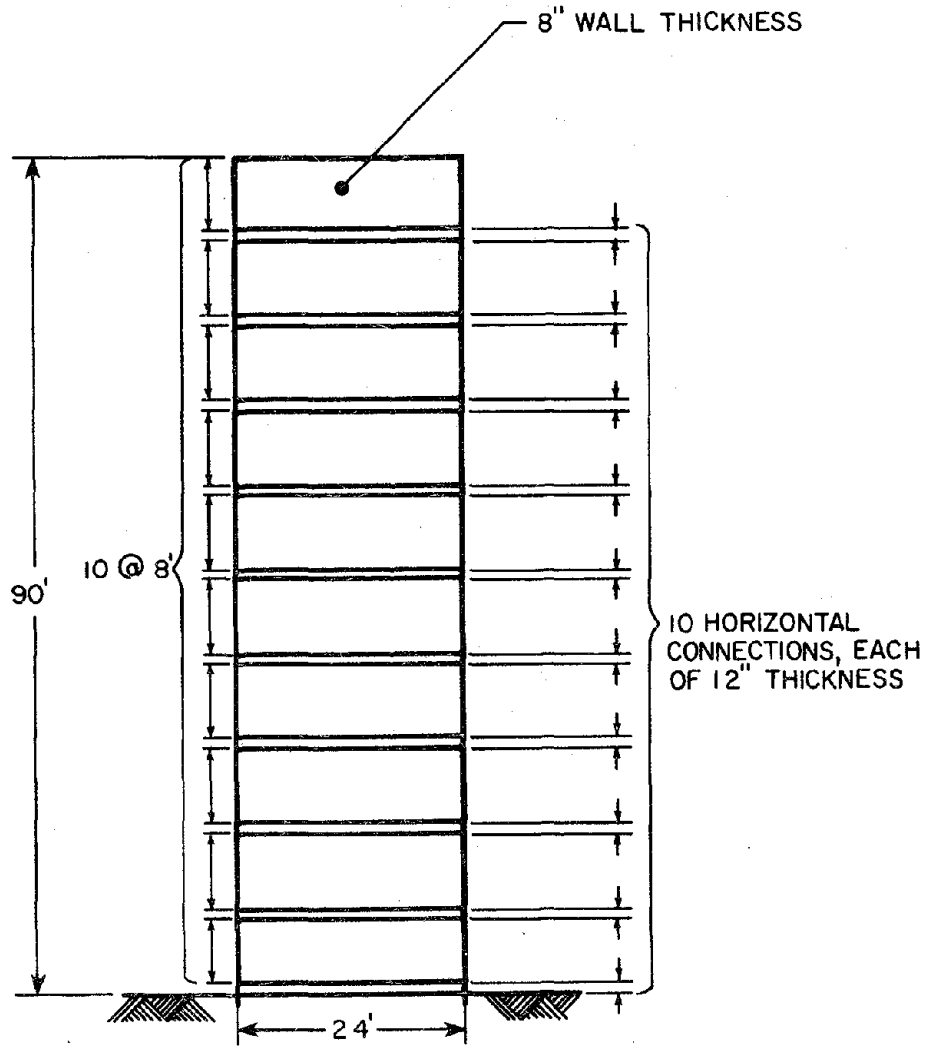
TYPICAL LARGE PANEL WALL
